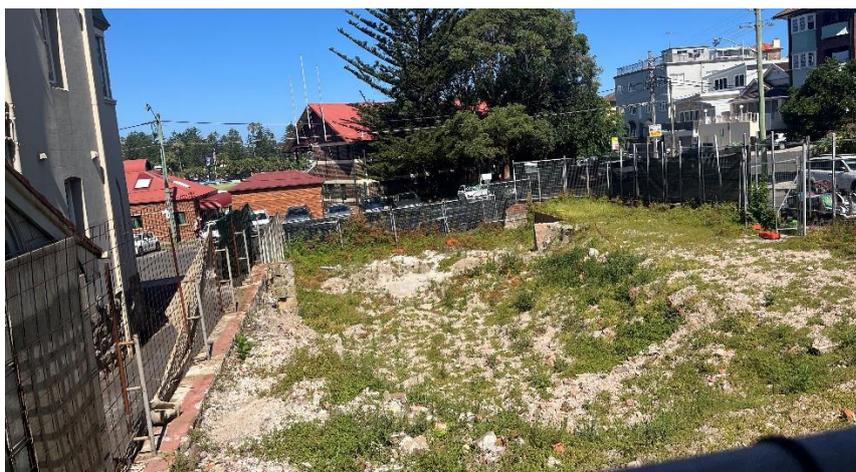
Photo of the subject site from 7 Ormond Gardens looking east (Source: Randwick City Council)
